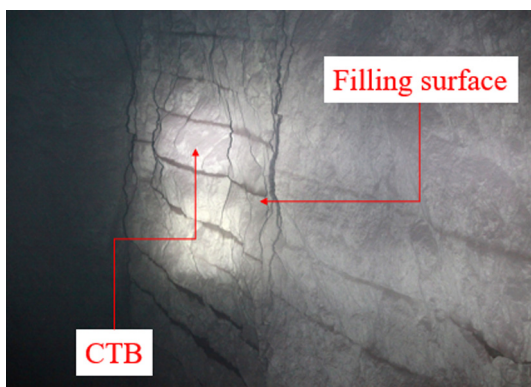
Structural phenomenon in the underground cemented tailings backfill.
